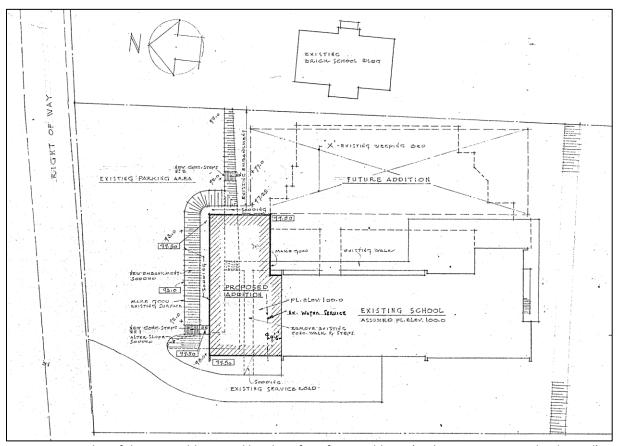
Site plan of the 1968 addition and hatching for a future addition (York Region District School Board)
